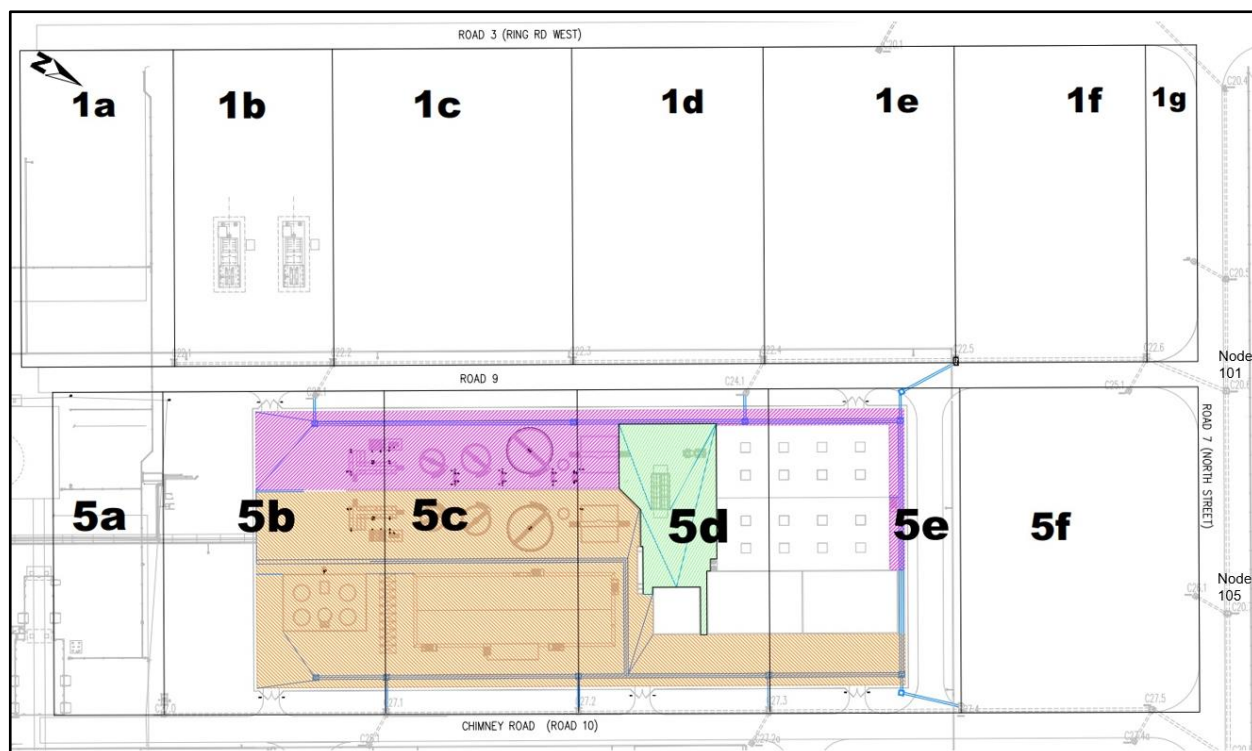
Layout Indicating Sub-Catchment Areas and Existing Stormwater Inlets
